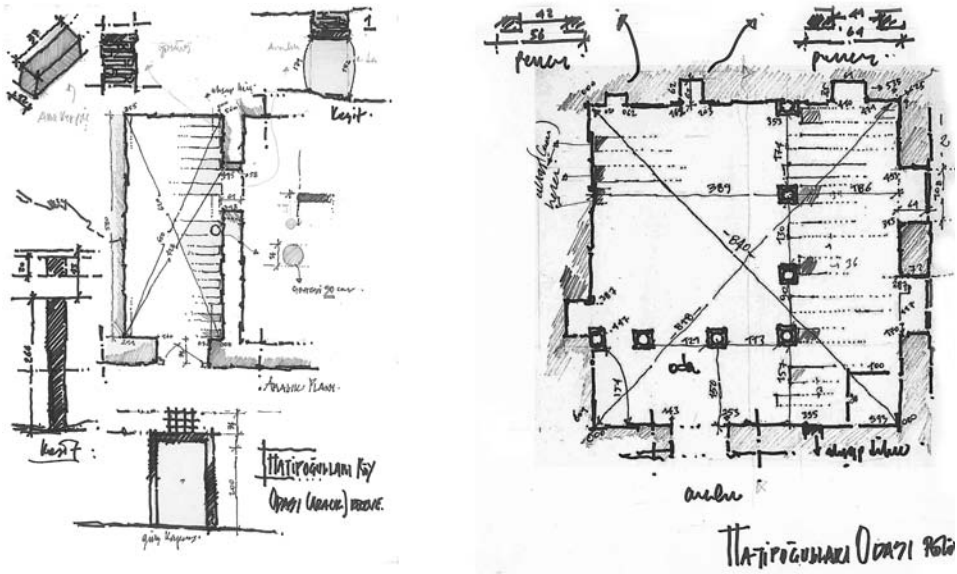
Plan and cross section relief of Hatipoğulları guestroom. Photo by Uğur Tuztaş 2010.
